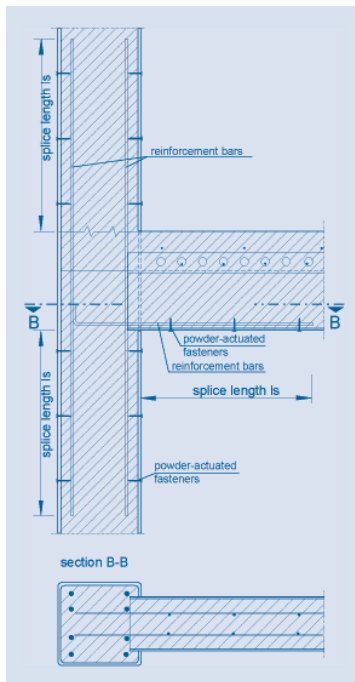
Detail of simply supported beam - column connection: (a) longitudinal section, (b) horizontal section
